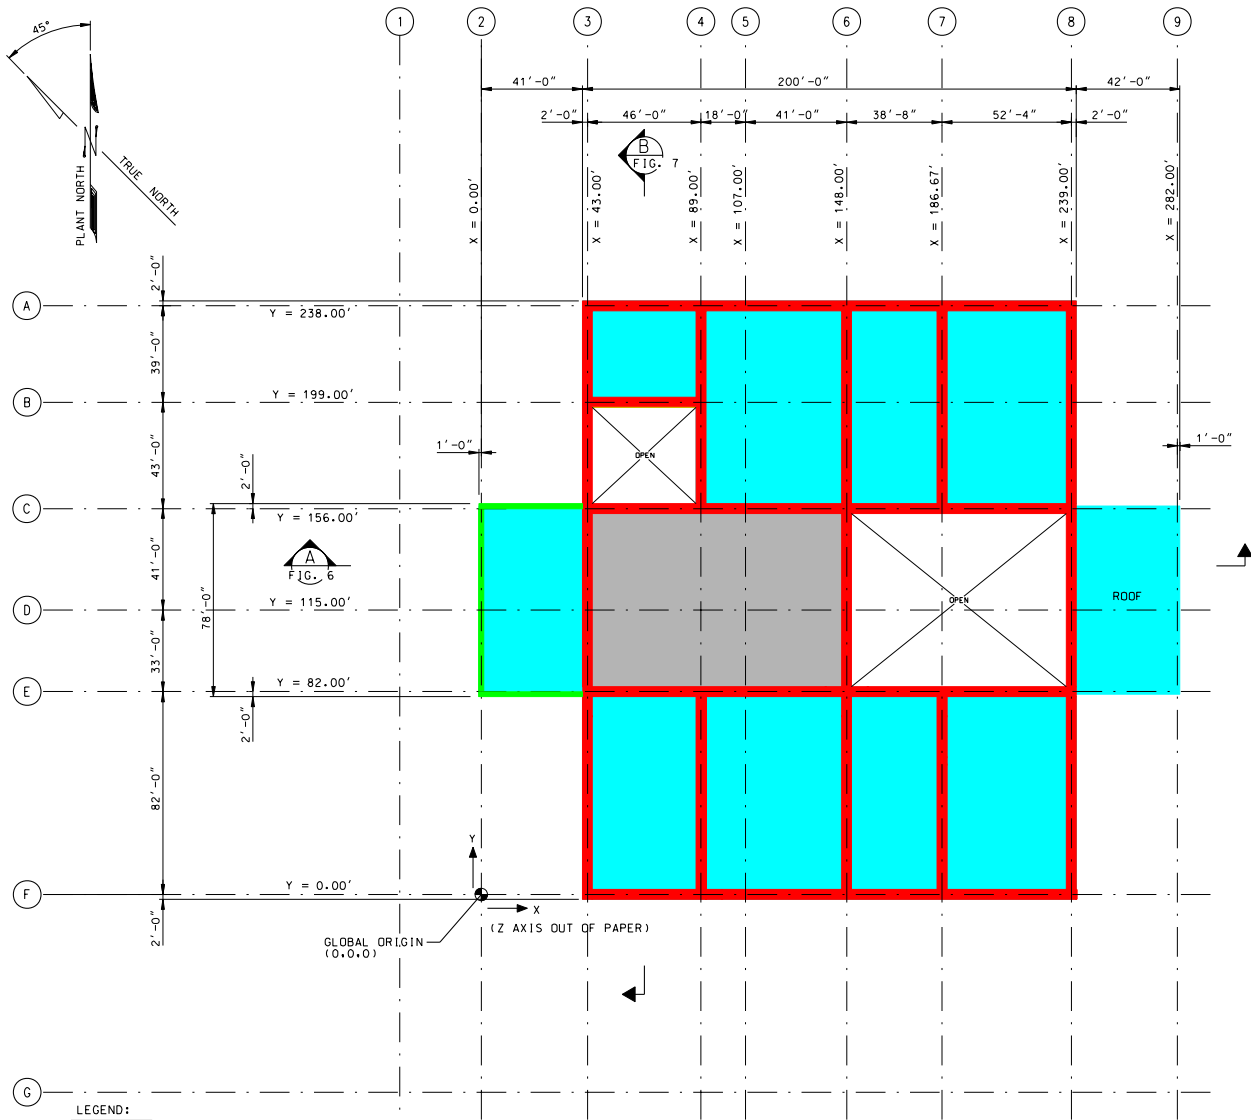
FLOOR/ ROOF PLAN AT EL 32'-0" & WALLS FROM EL 32'-0" TO EL 64'-0"
